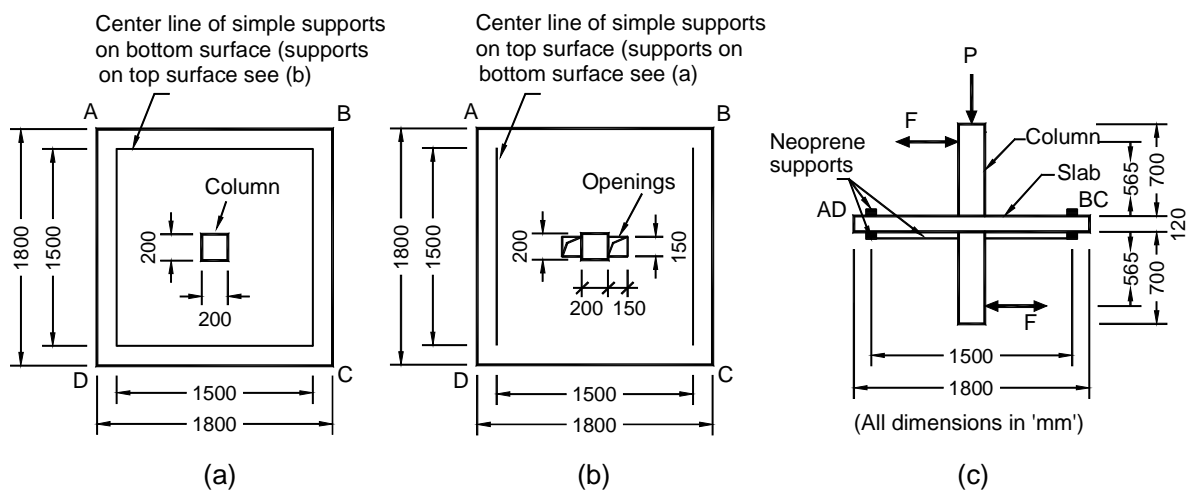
Dimensions of the specimens SW1~SW9 (all dimensions in 'mm')
